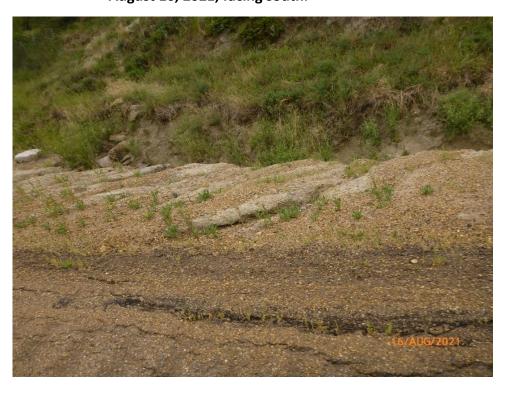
Northern side of the road shoulder cracking due to eroding road embankment. Photo was taken on August 16, 2021, facing north-west.
